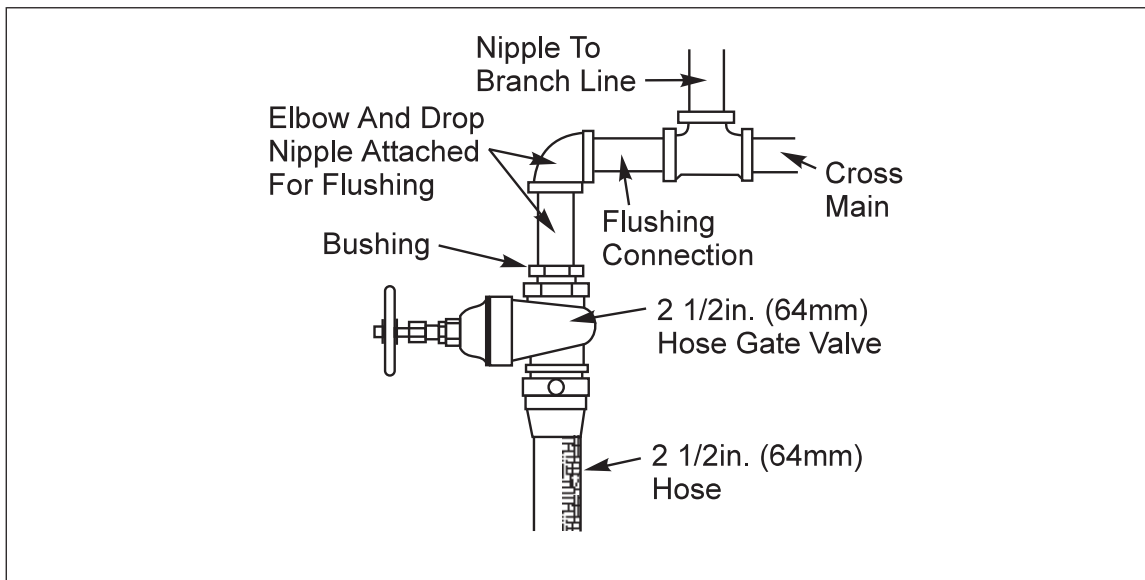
Connection of a 2-1/2 in. (64 mm) hose gate valve with 2 in. (50mm) bushing and nipple and elbow to 2 in. (50 mm) cross main.
